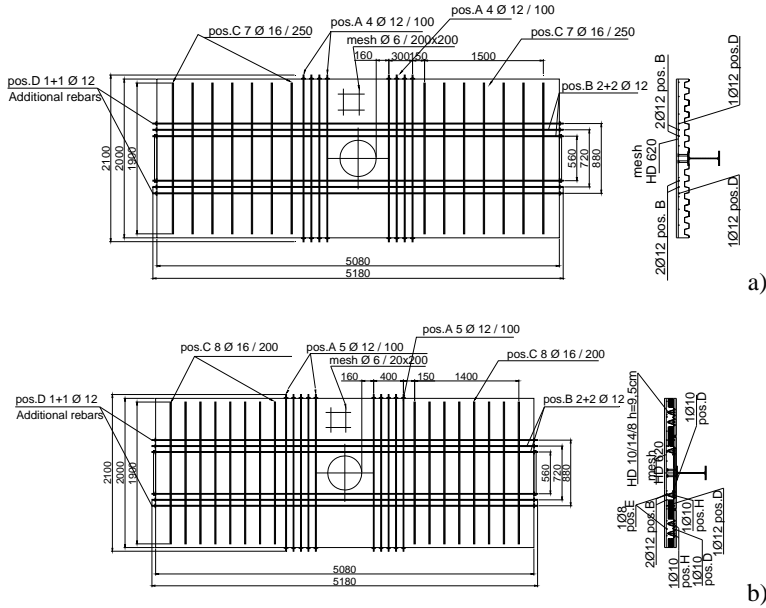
Slab reinforcement of a) a profiled steel sheeting slab; b) of a prefabricated lattice girder slab.
